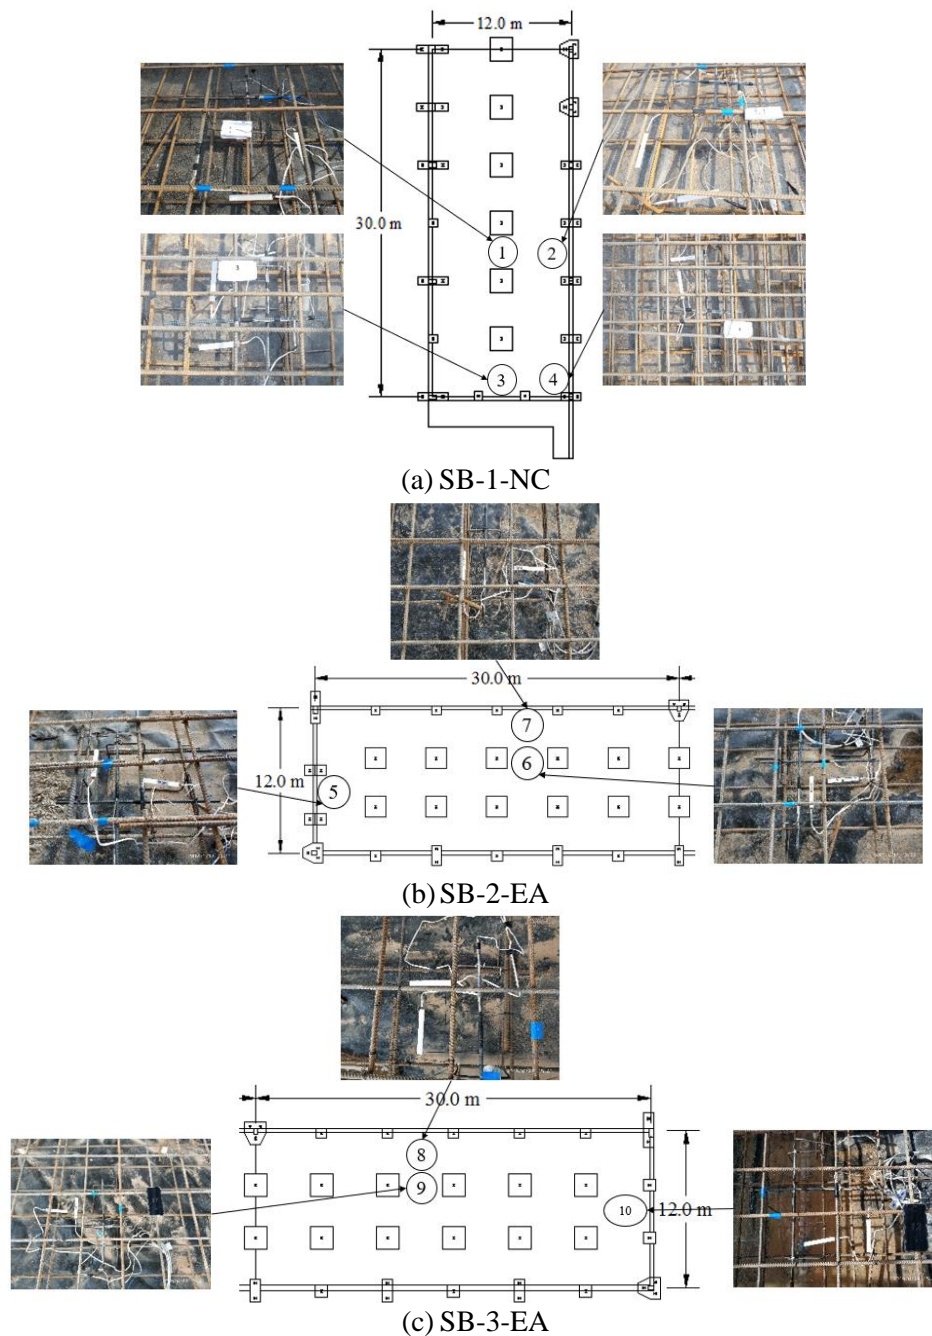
Measurement locations for slabs on beam at construction site 1
